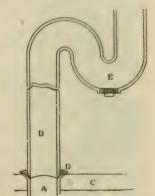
Sketc. showing the cup-joint method of connecting lead pipe. A, Waste pipe; B, sink connection; C, floor; D, solder joint. or cup; E, trap.
